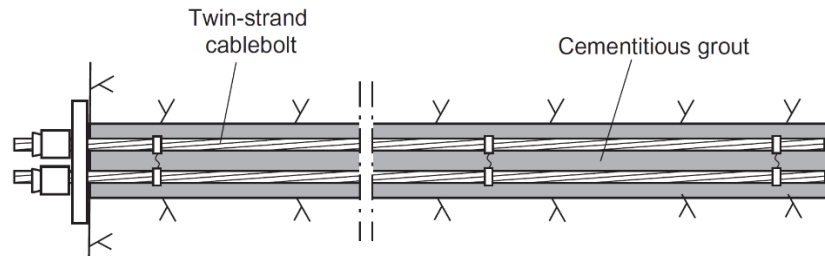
Cement grouted cable bolts, double strand (Li, 2017b).
